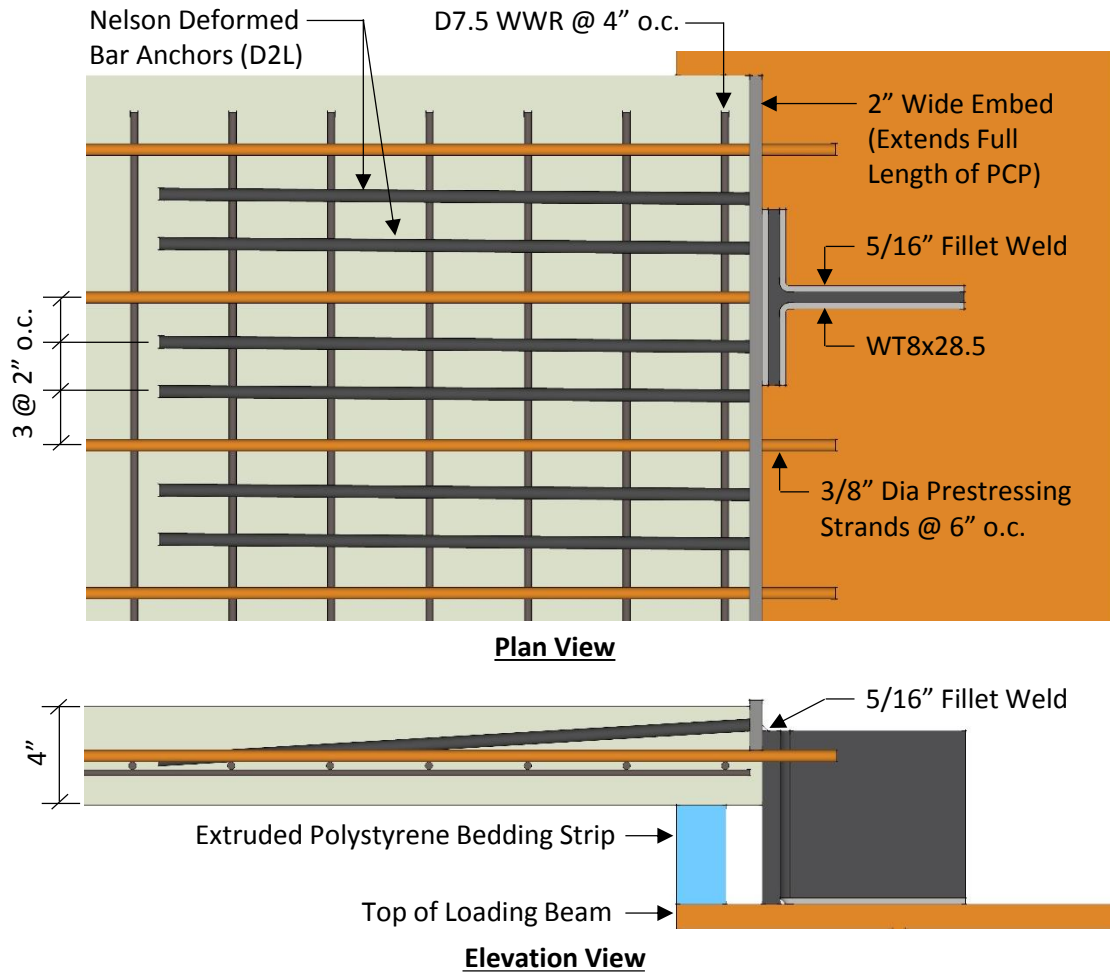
Plan and Elevation Views of the Embed-Anchor Detail
